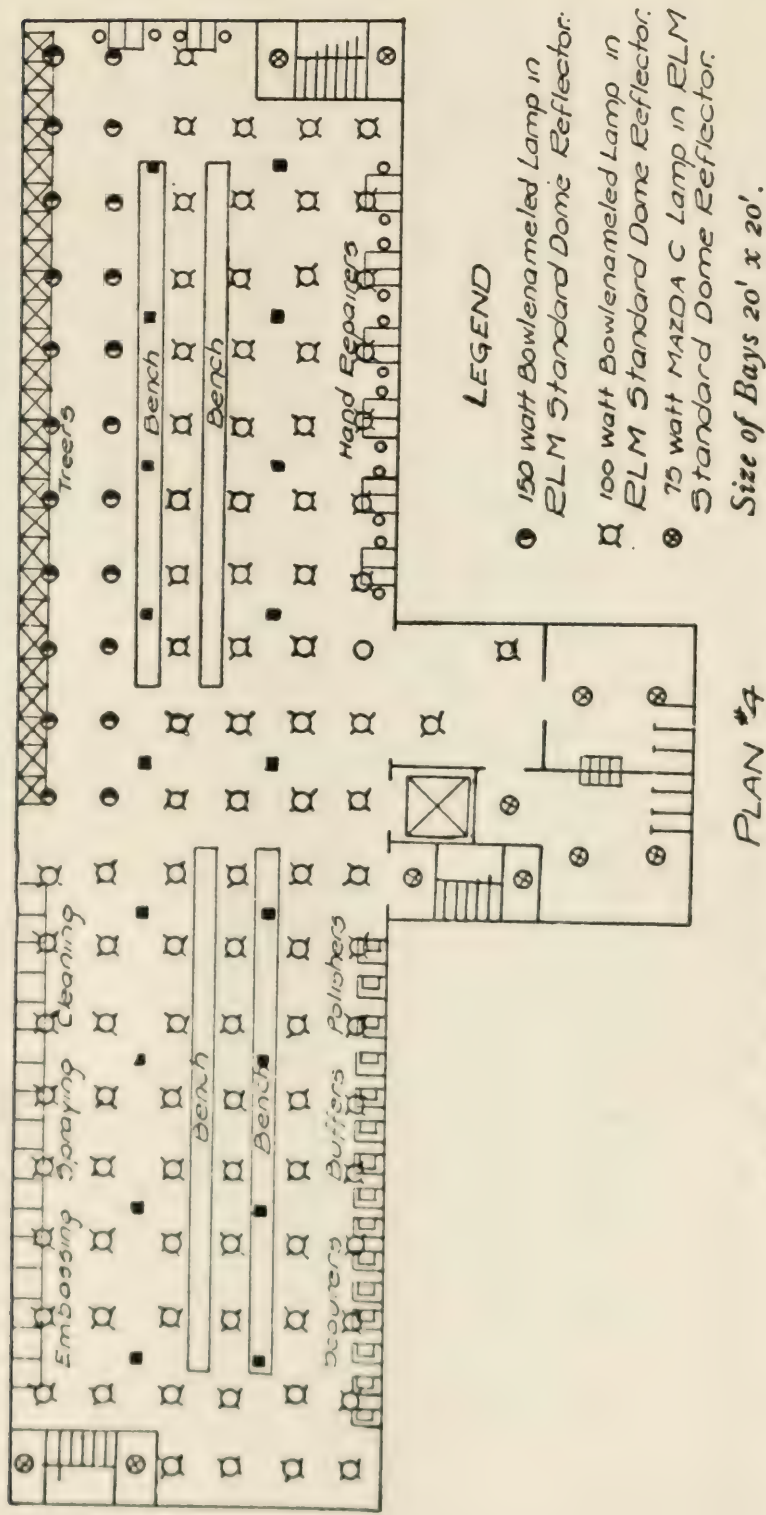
Model shoe factory, second floor plan, finishing department.
